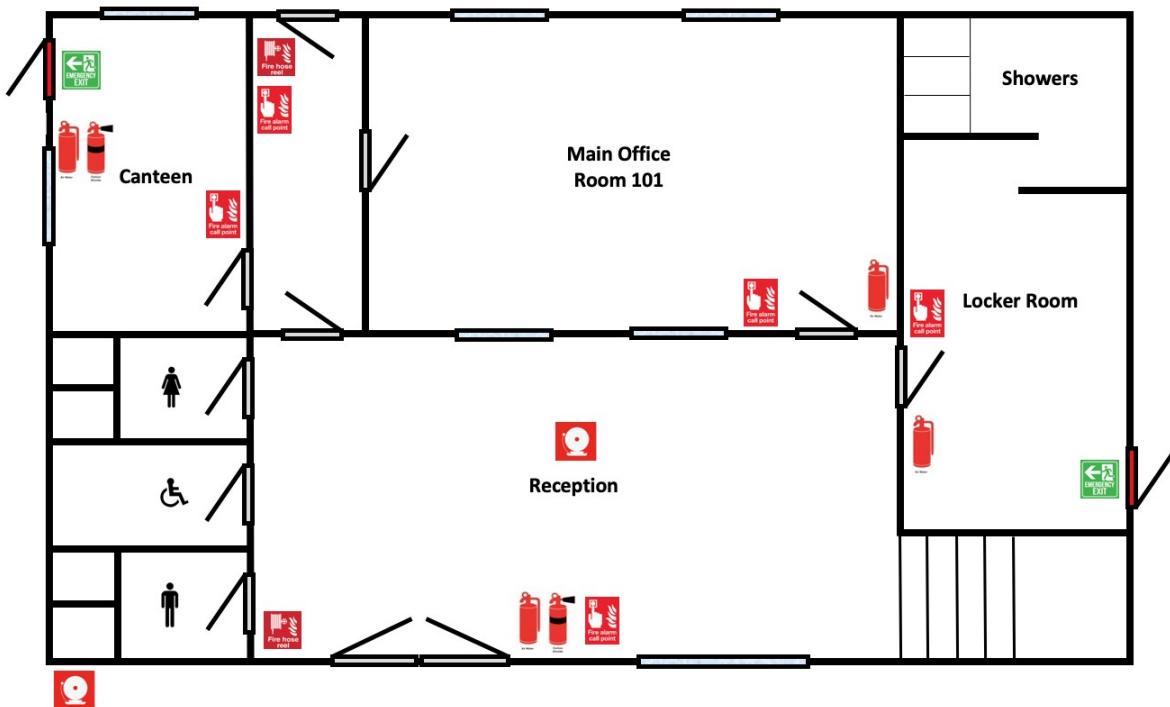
Alpha Beta Main Office Building Lower Floor Plan
